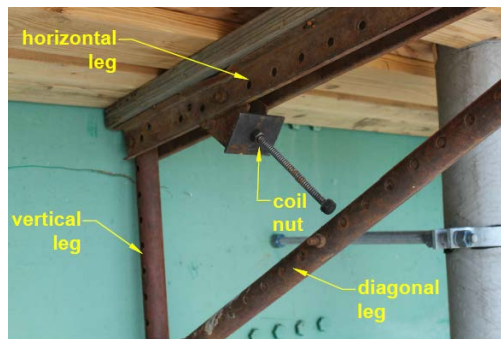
shows the bracket assembly. In step 1, steel hangers (Dayton Superior 2015) were attached to the top flange of the girder, which was embedded in the concrete during construction. In step 2, the hanger and steel bracket were connected by the coil rod. In step 3, overhanging brackets that support the plywood overhang formwork were installed.
